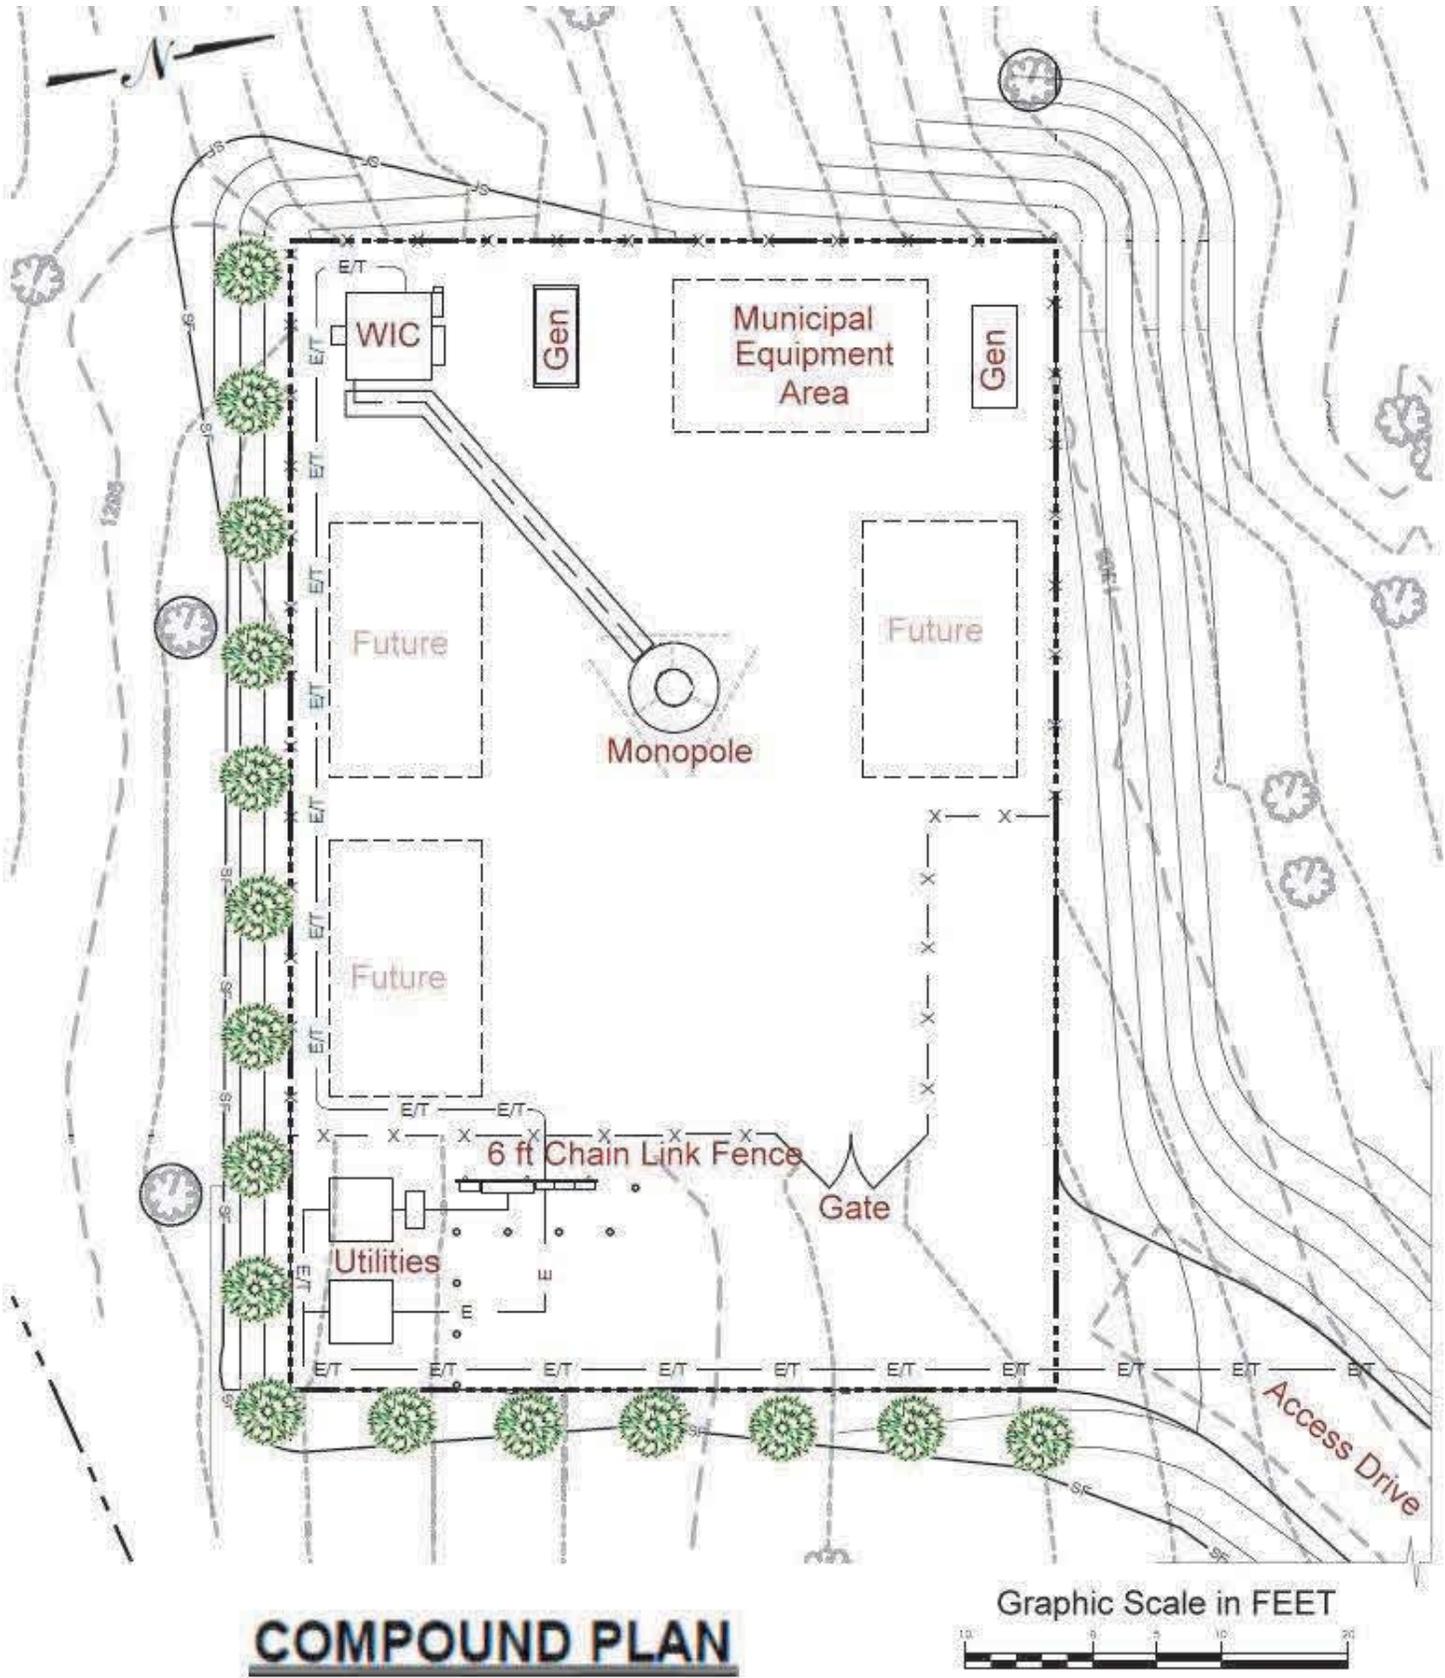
Plan Showing the Proposed Layout of the Equipment Compound
